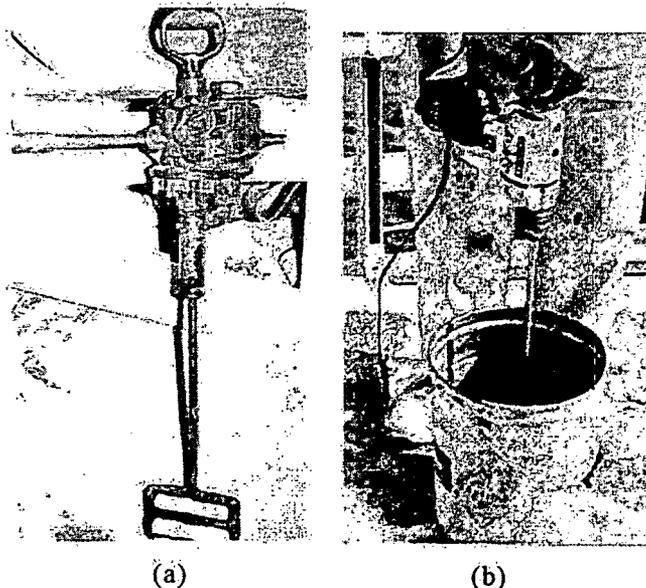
Mixing of epoxy system components can be performed using a blade on a drill. Shown here are (a) pneumatic and (b) electric drills (courtesy L. Mitchell, Consulting Engineer, and Sika Chemical Corp.)
